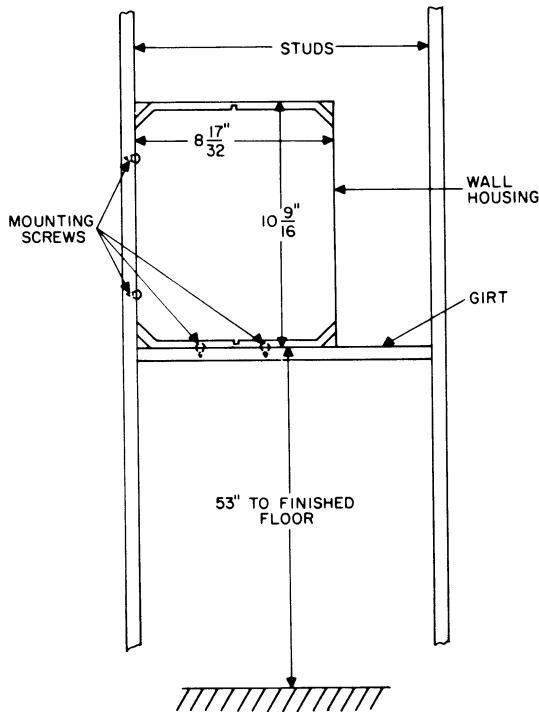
Wall Housing Mounted to Studding When Fully-Framed Opening is not Available.
